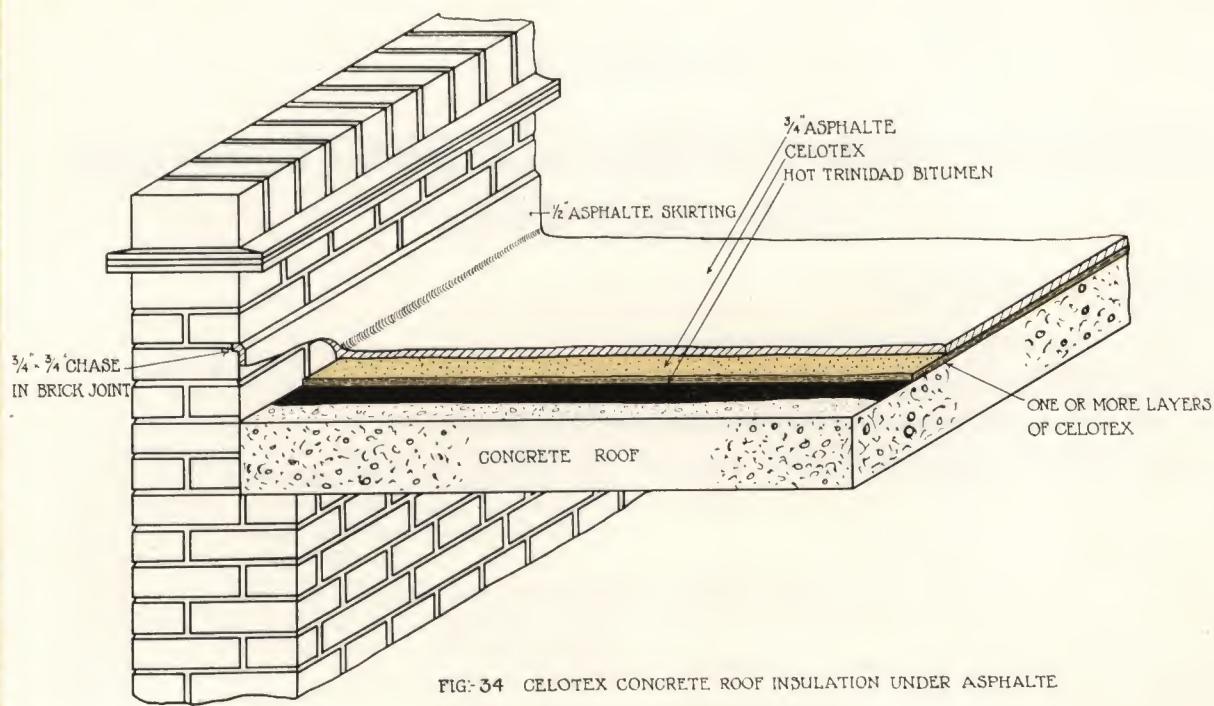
CELOTEX CONCRETE ROOF INSULATION UNDER ASPHALTE
